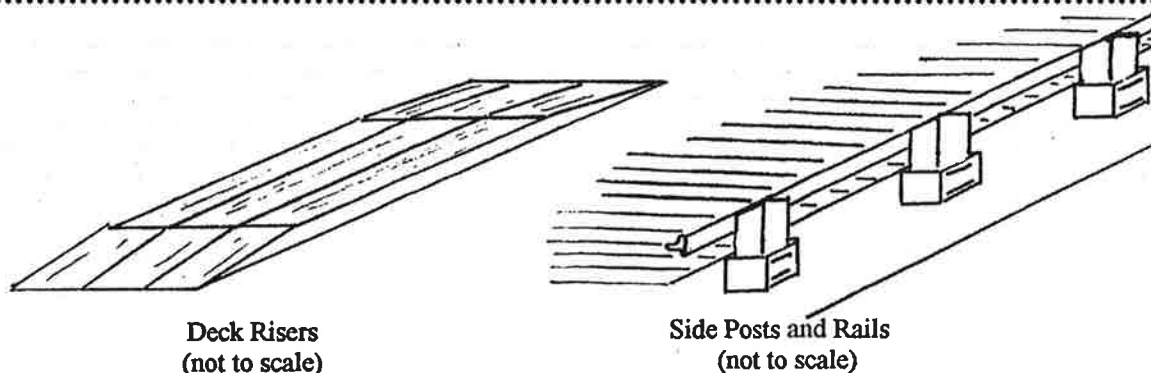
After making your cuts, rearrange your deck parts as shown above. Discard those pieces not required. Consider colour coding the pieces when cutting to ensure this.
